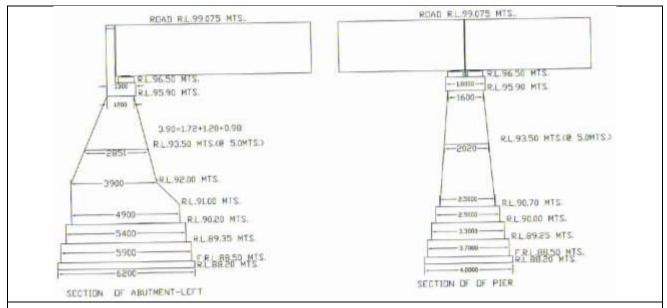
Typical Cross section – Plate 6 (Mass Concrete Pier and Abutments)
